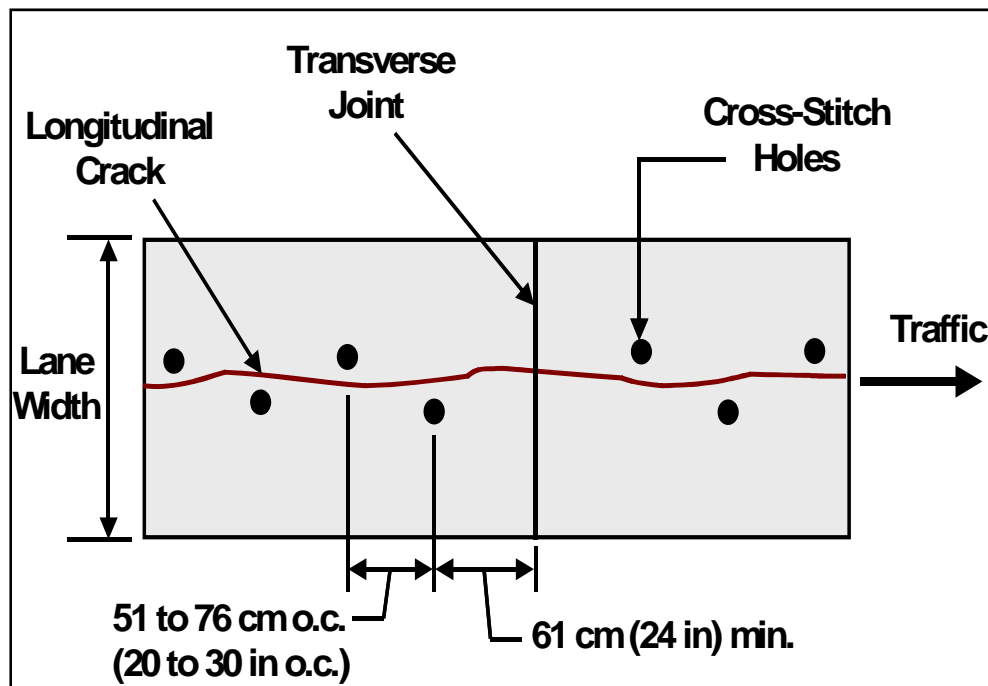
Plan View of Cross Stitching Layout (Fowler et al. 2005b)
